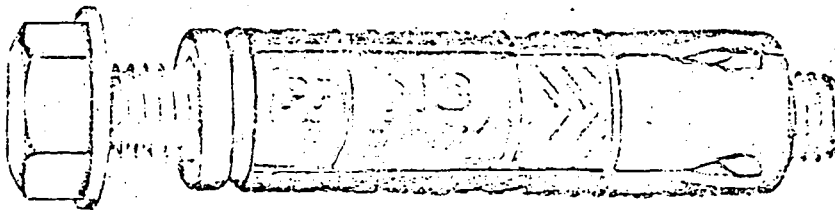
(0) Machine expansion bolt - with galvanized bolts and washers, mainly for floor anchorages
